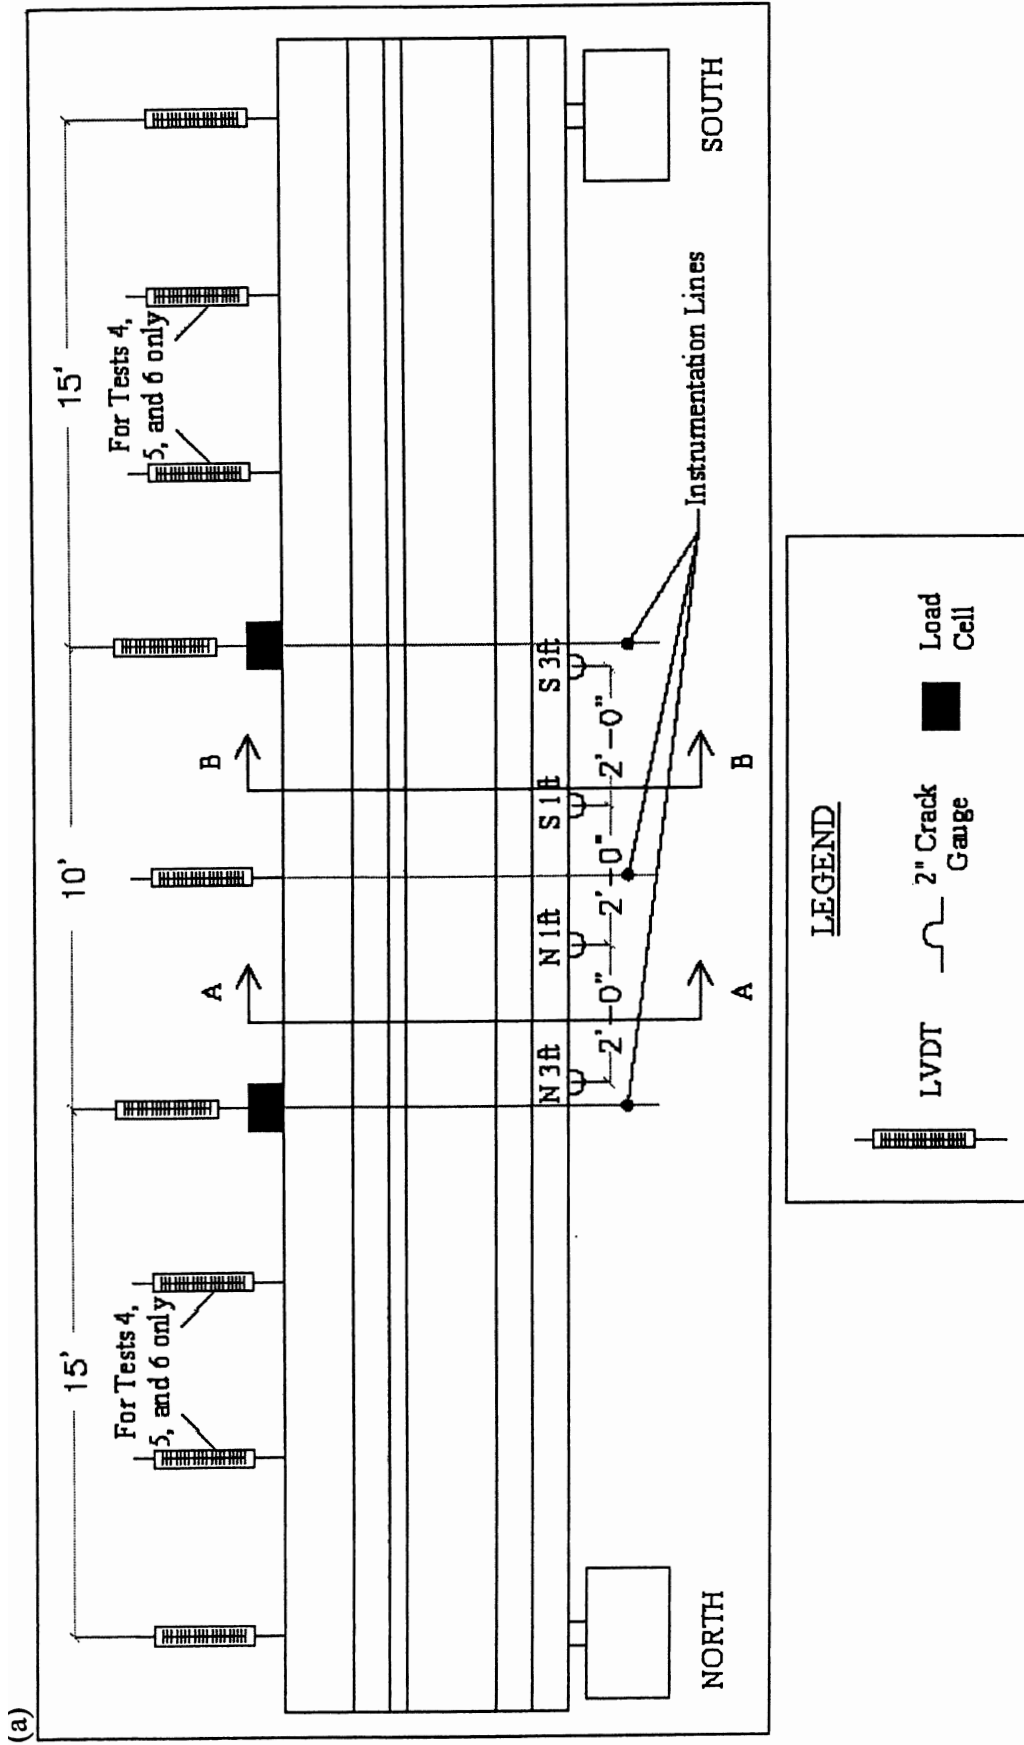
Typical Instrumentation for Four-Point Bending Tests a) Typical Instrumentation Layout for Test Specimens 1, 2, 3, 4, 5, 6
